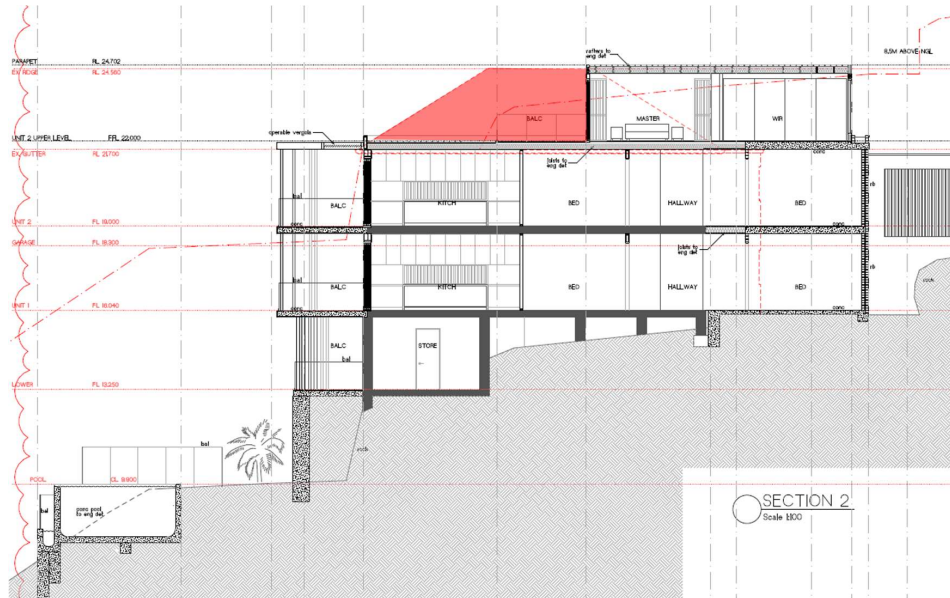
Extract of Section 2 with existing roof form above the height plane to be demolished shown in red.
